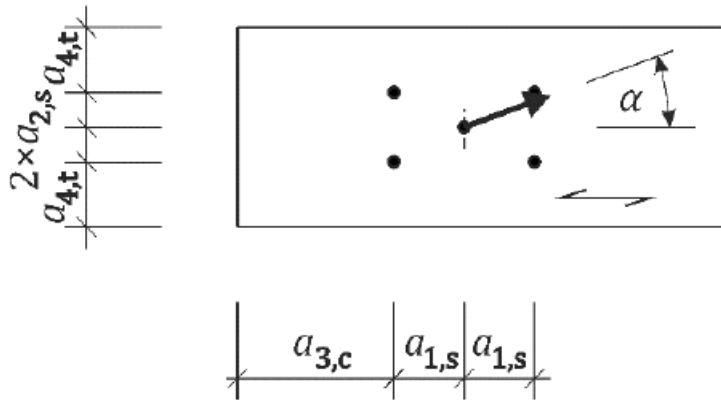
Minimum spacing of staggered fasteners due to a force transmitted by the fasteners in their center of gravity [1].
